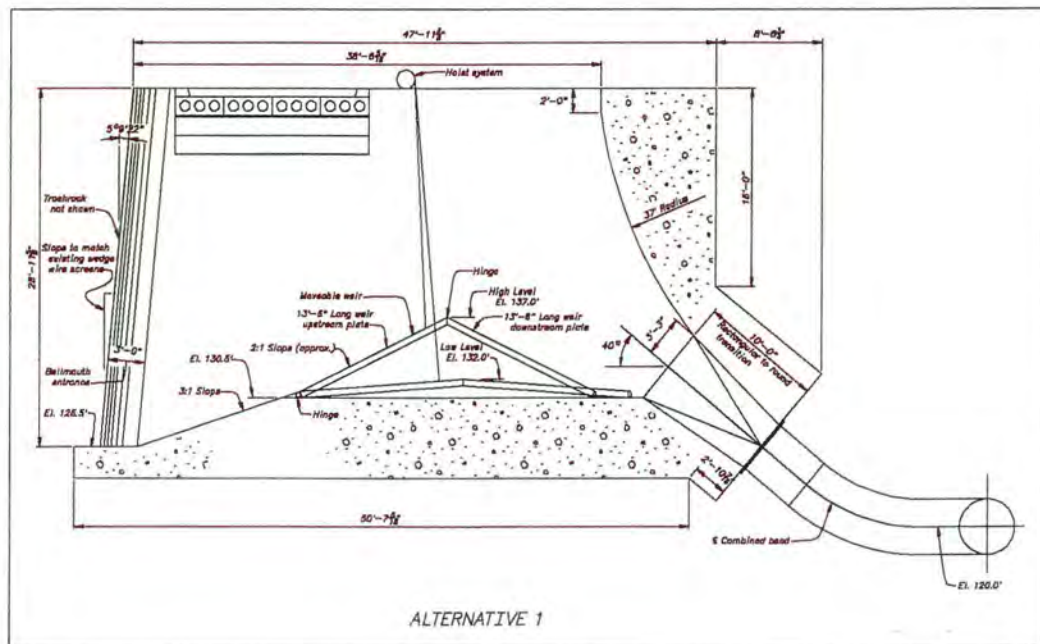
Elevation view of adjustable height ramped weir concept for fish bypass.
